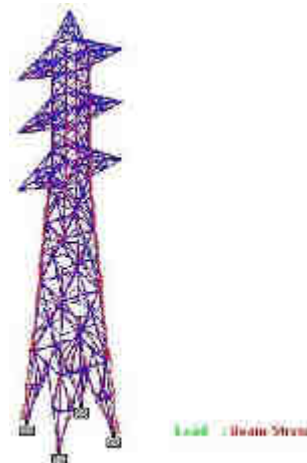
Isometric View of Steel Transmission Tower showing stresses
